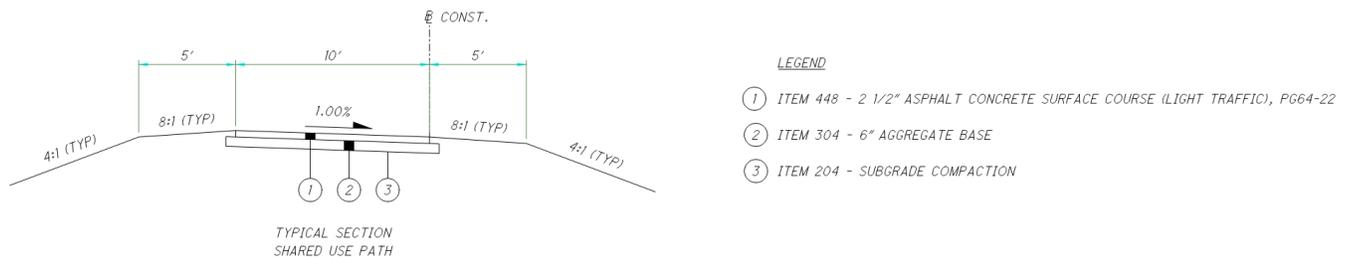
Trail Typical Section on Abandoned Rail Bed
